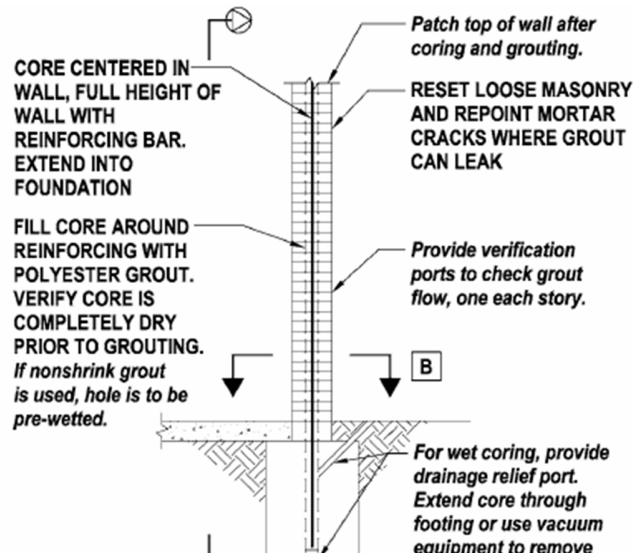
Non-stresses bounded bar inserted into masonry wall
